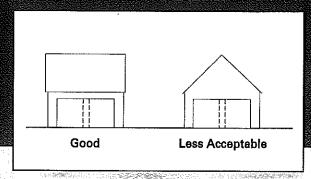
DOUBLE GARAGE ELEVATION 2 Doors preferred
